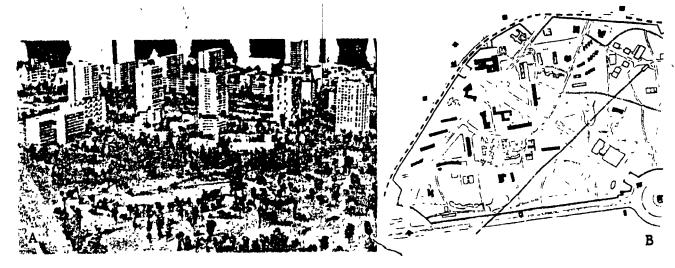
Mixed settlement type of row- and detached houses as well as highrise slab and point blocks. Detroit. Lafayette Park, 1956. A - Site plan, B - Aerial view. (L'architecture d'aujourd'hui, 1958)
